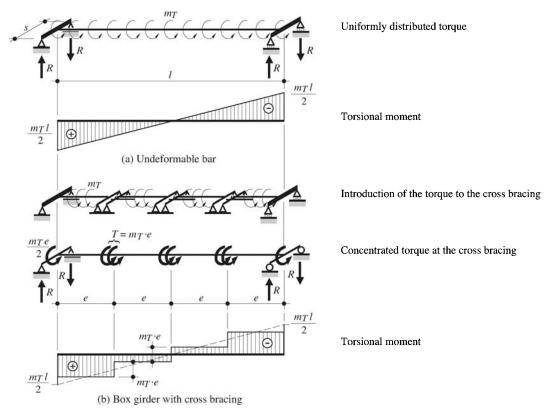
Behaviour of a box girder bridge subject to a uniformly distributed torque.
